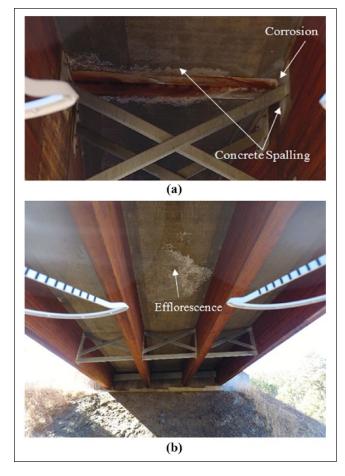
Underside of deck damage detected using UAS: (a) concrete spalling and corrosion with exposed rebar at Girder 4 and 1 and (b) efflorescence in Bay 2 between South Abutment and Joint 1.
